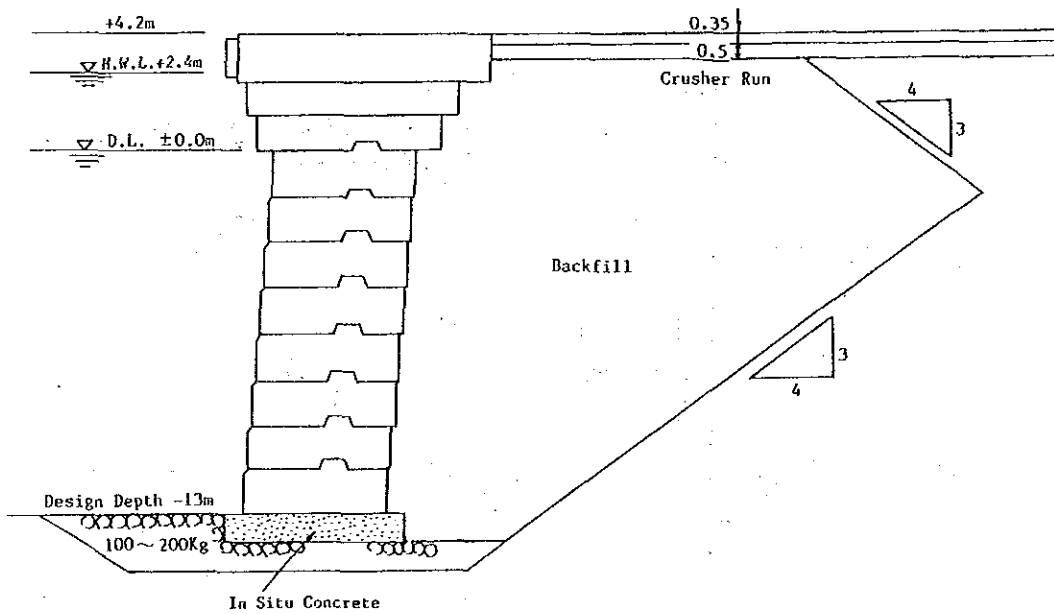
Proposed Cross Section of the Bank (-13m)
